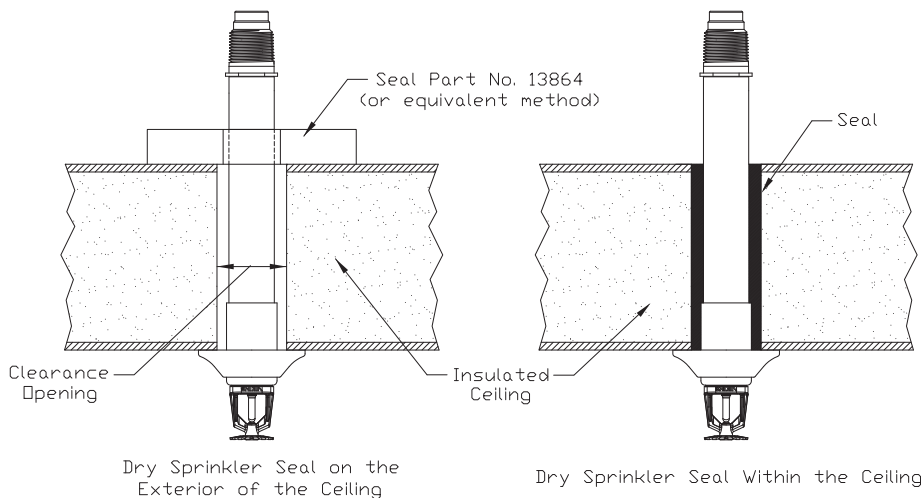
Dry Sprinkler Seal (Adjustable Standard Dry Pendent Sprinkler is Shown)
